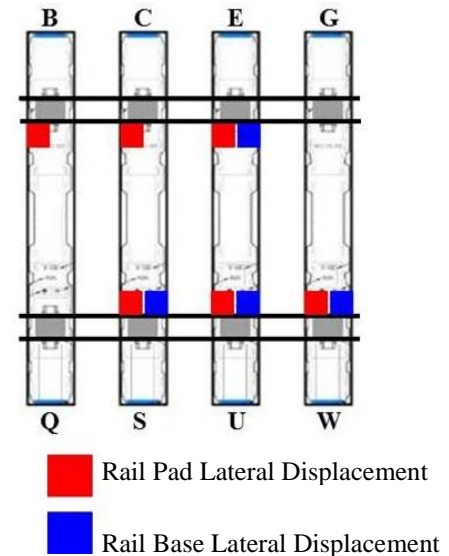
LOCATION OF INSTRUMENTATION AND NAMING CONVENTION FOR RAIL SEATS AND CRIBS LOCATED AT THE RTT AND HTL TRACK SECTIONS
